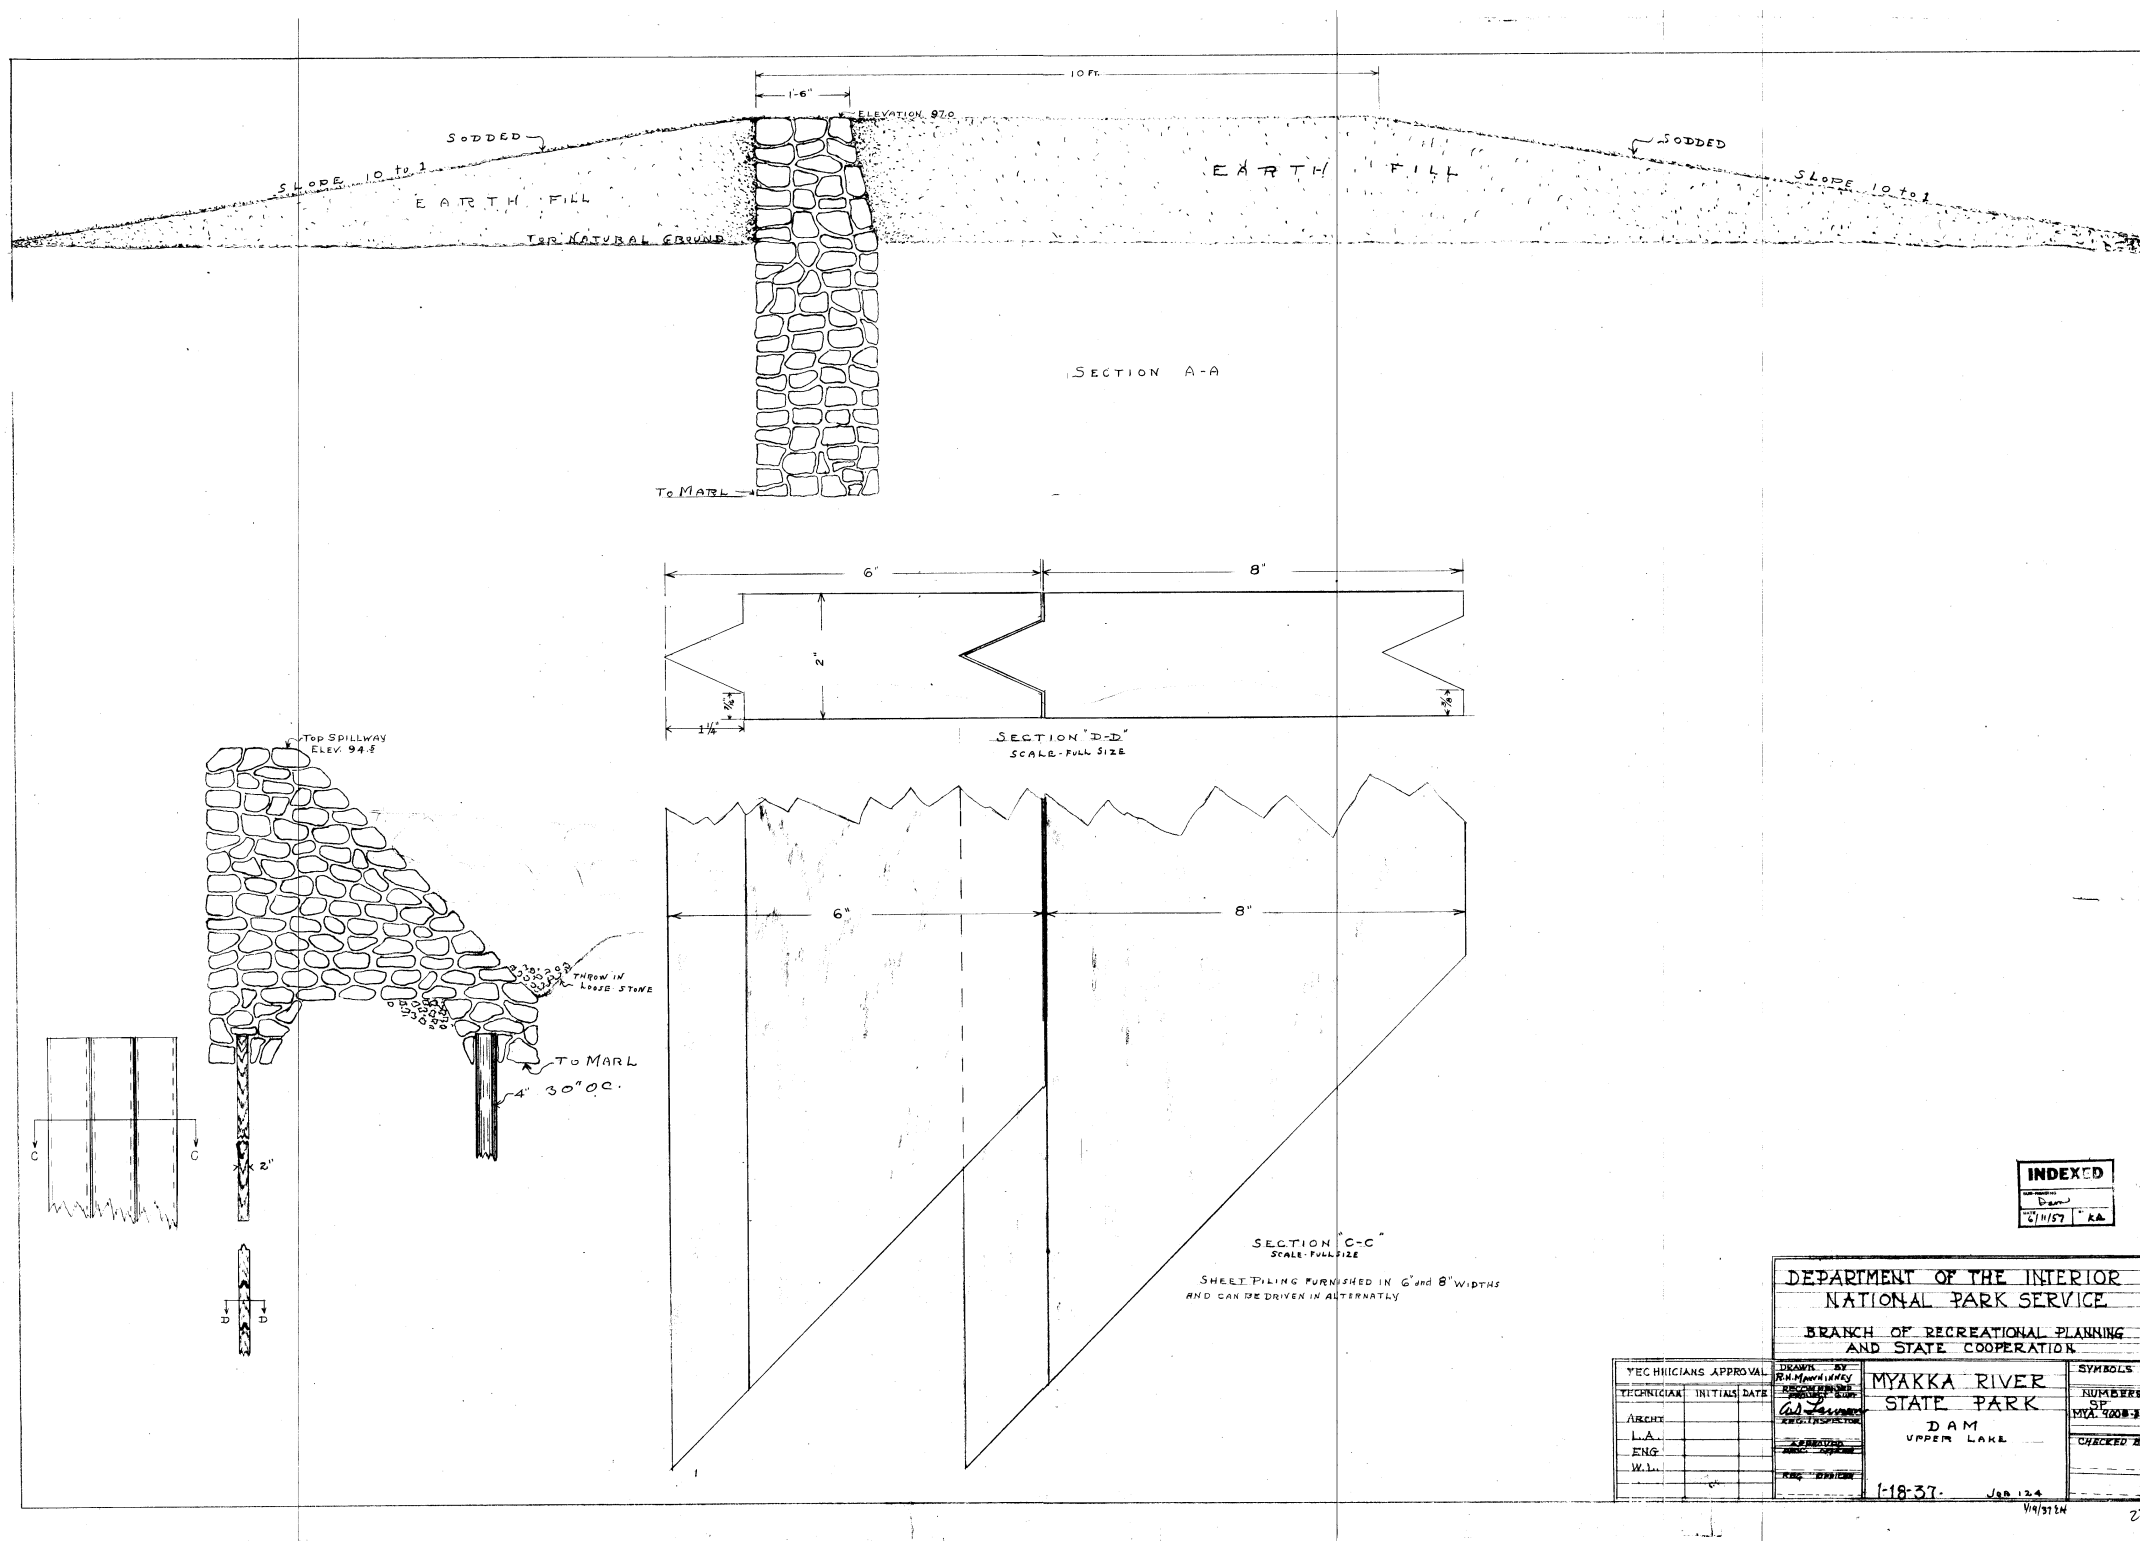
Detailed plans from 1937 original design of the Upper Myakka Dam (8S02273) on the Upper Myakka Lake.
